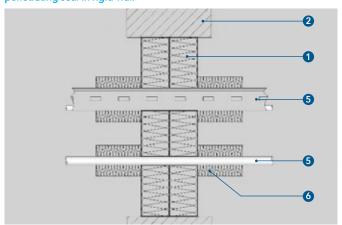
Steel cable tray / Cables and conduits penetrating seal in flexible and rigid wall
